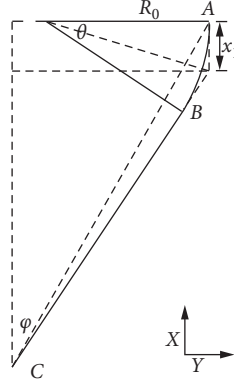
Calculation of horizontal bending angle of anchor span cable strand.
